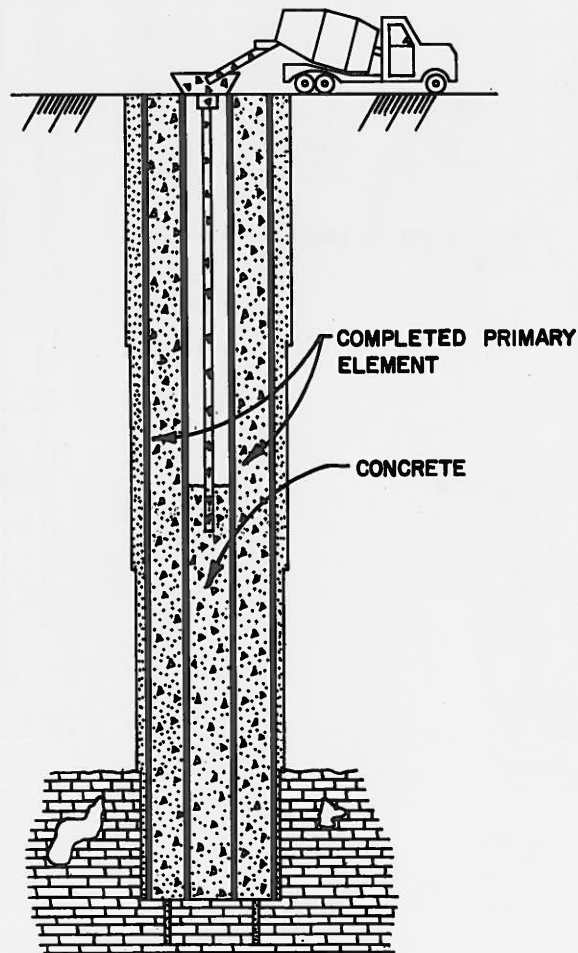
THE EXCAVATION IS CLEANED AND TREMIE CONCRETE PLACED TO COMPLETE A SECONDARY ELEMENT.
